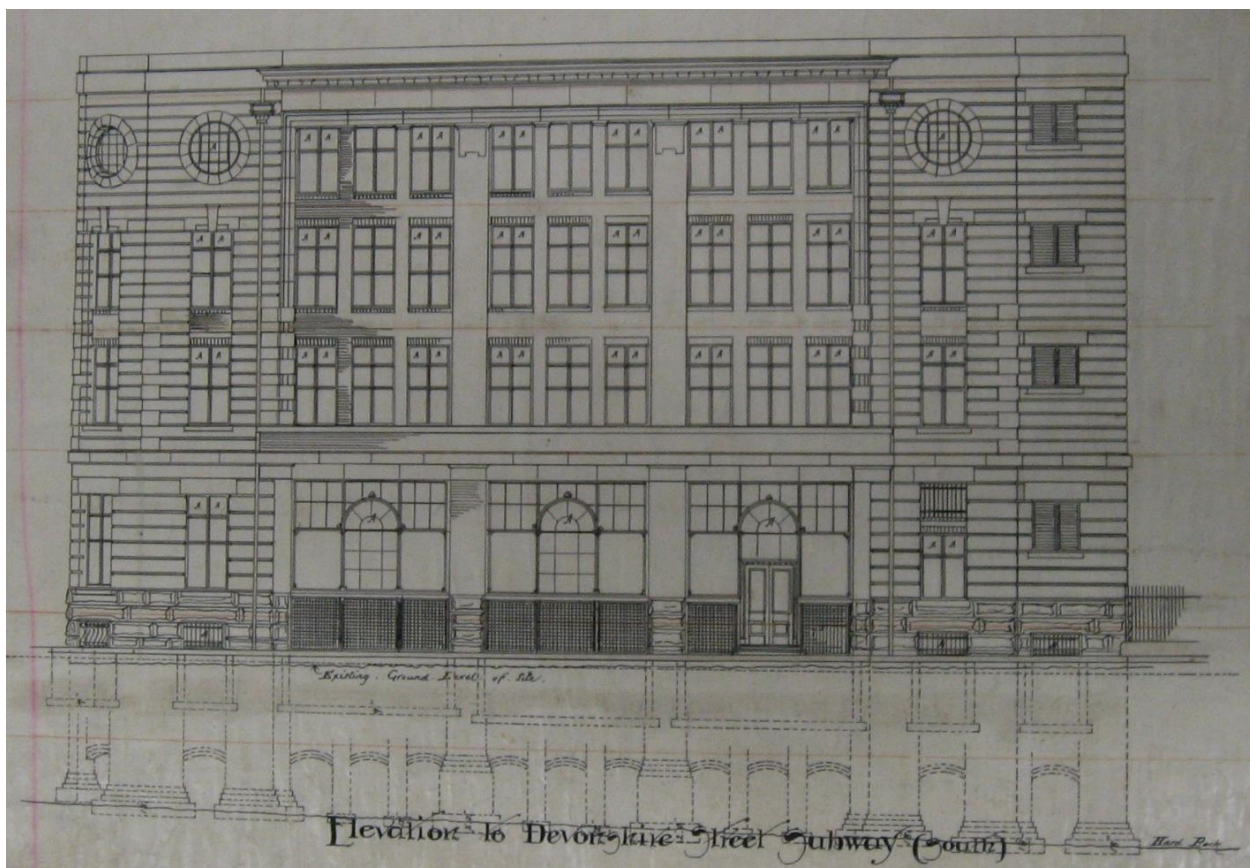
New Parcels Post Office Premises at the Central Railway Station Sydney: Elevation to Devonshire Street Subway (south), 1910.
